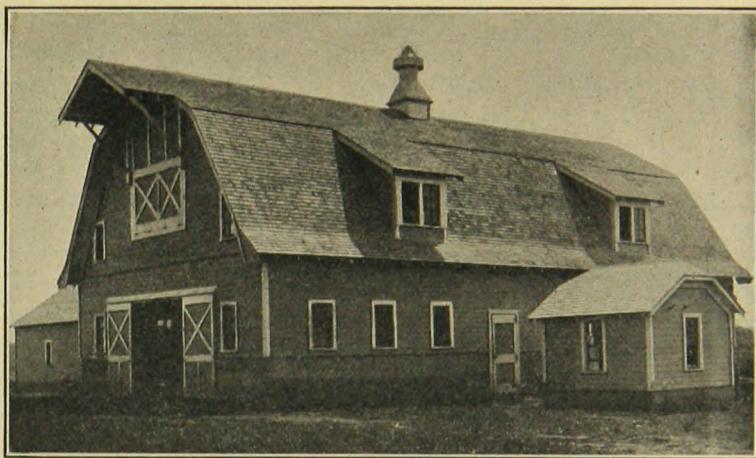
A Well Planned Minnesota Barn, Plan 197
